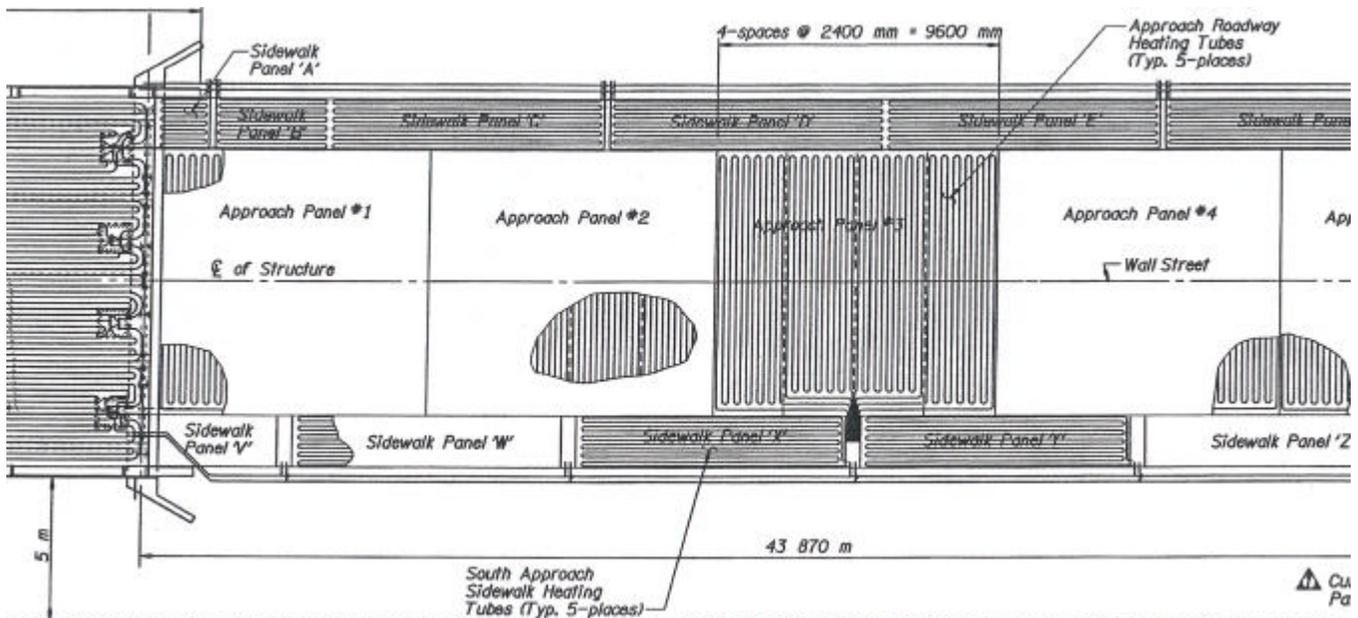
Portion of the Wall Street Project (ODOT, 2003)
